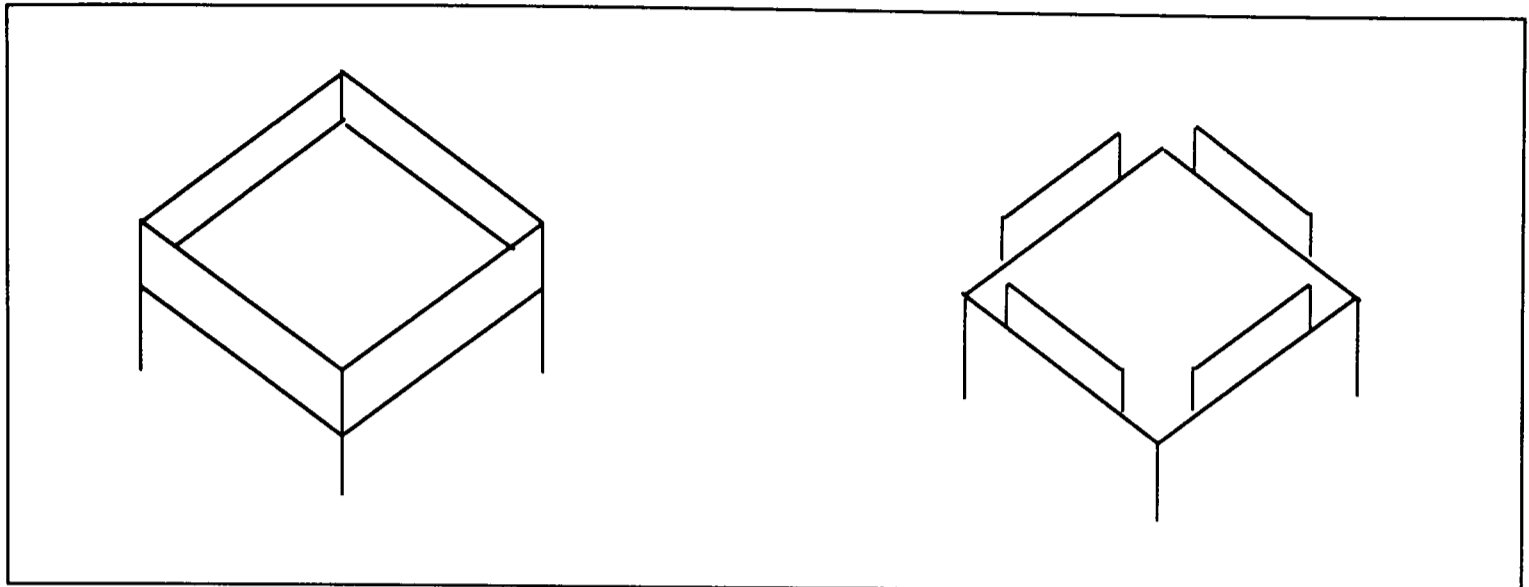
Full perimeter parapet (left) and modified cornerless parapet (right)
